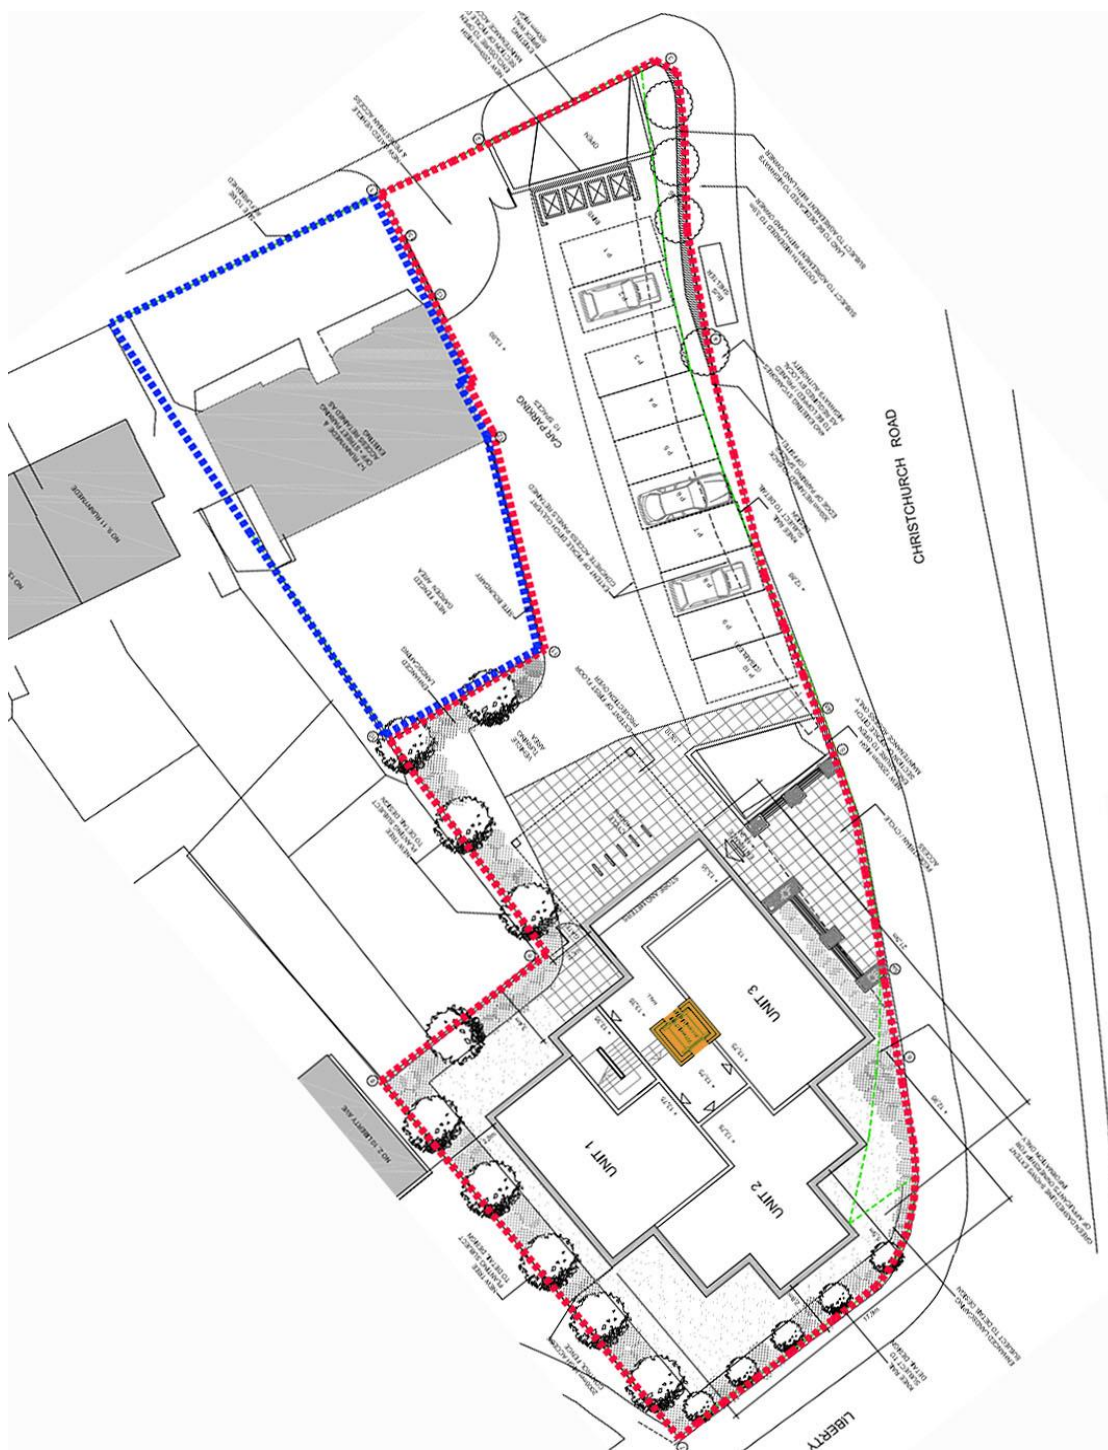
Proposed ground floor & site plan, with the lift pit location highlighted orange
